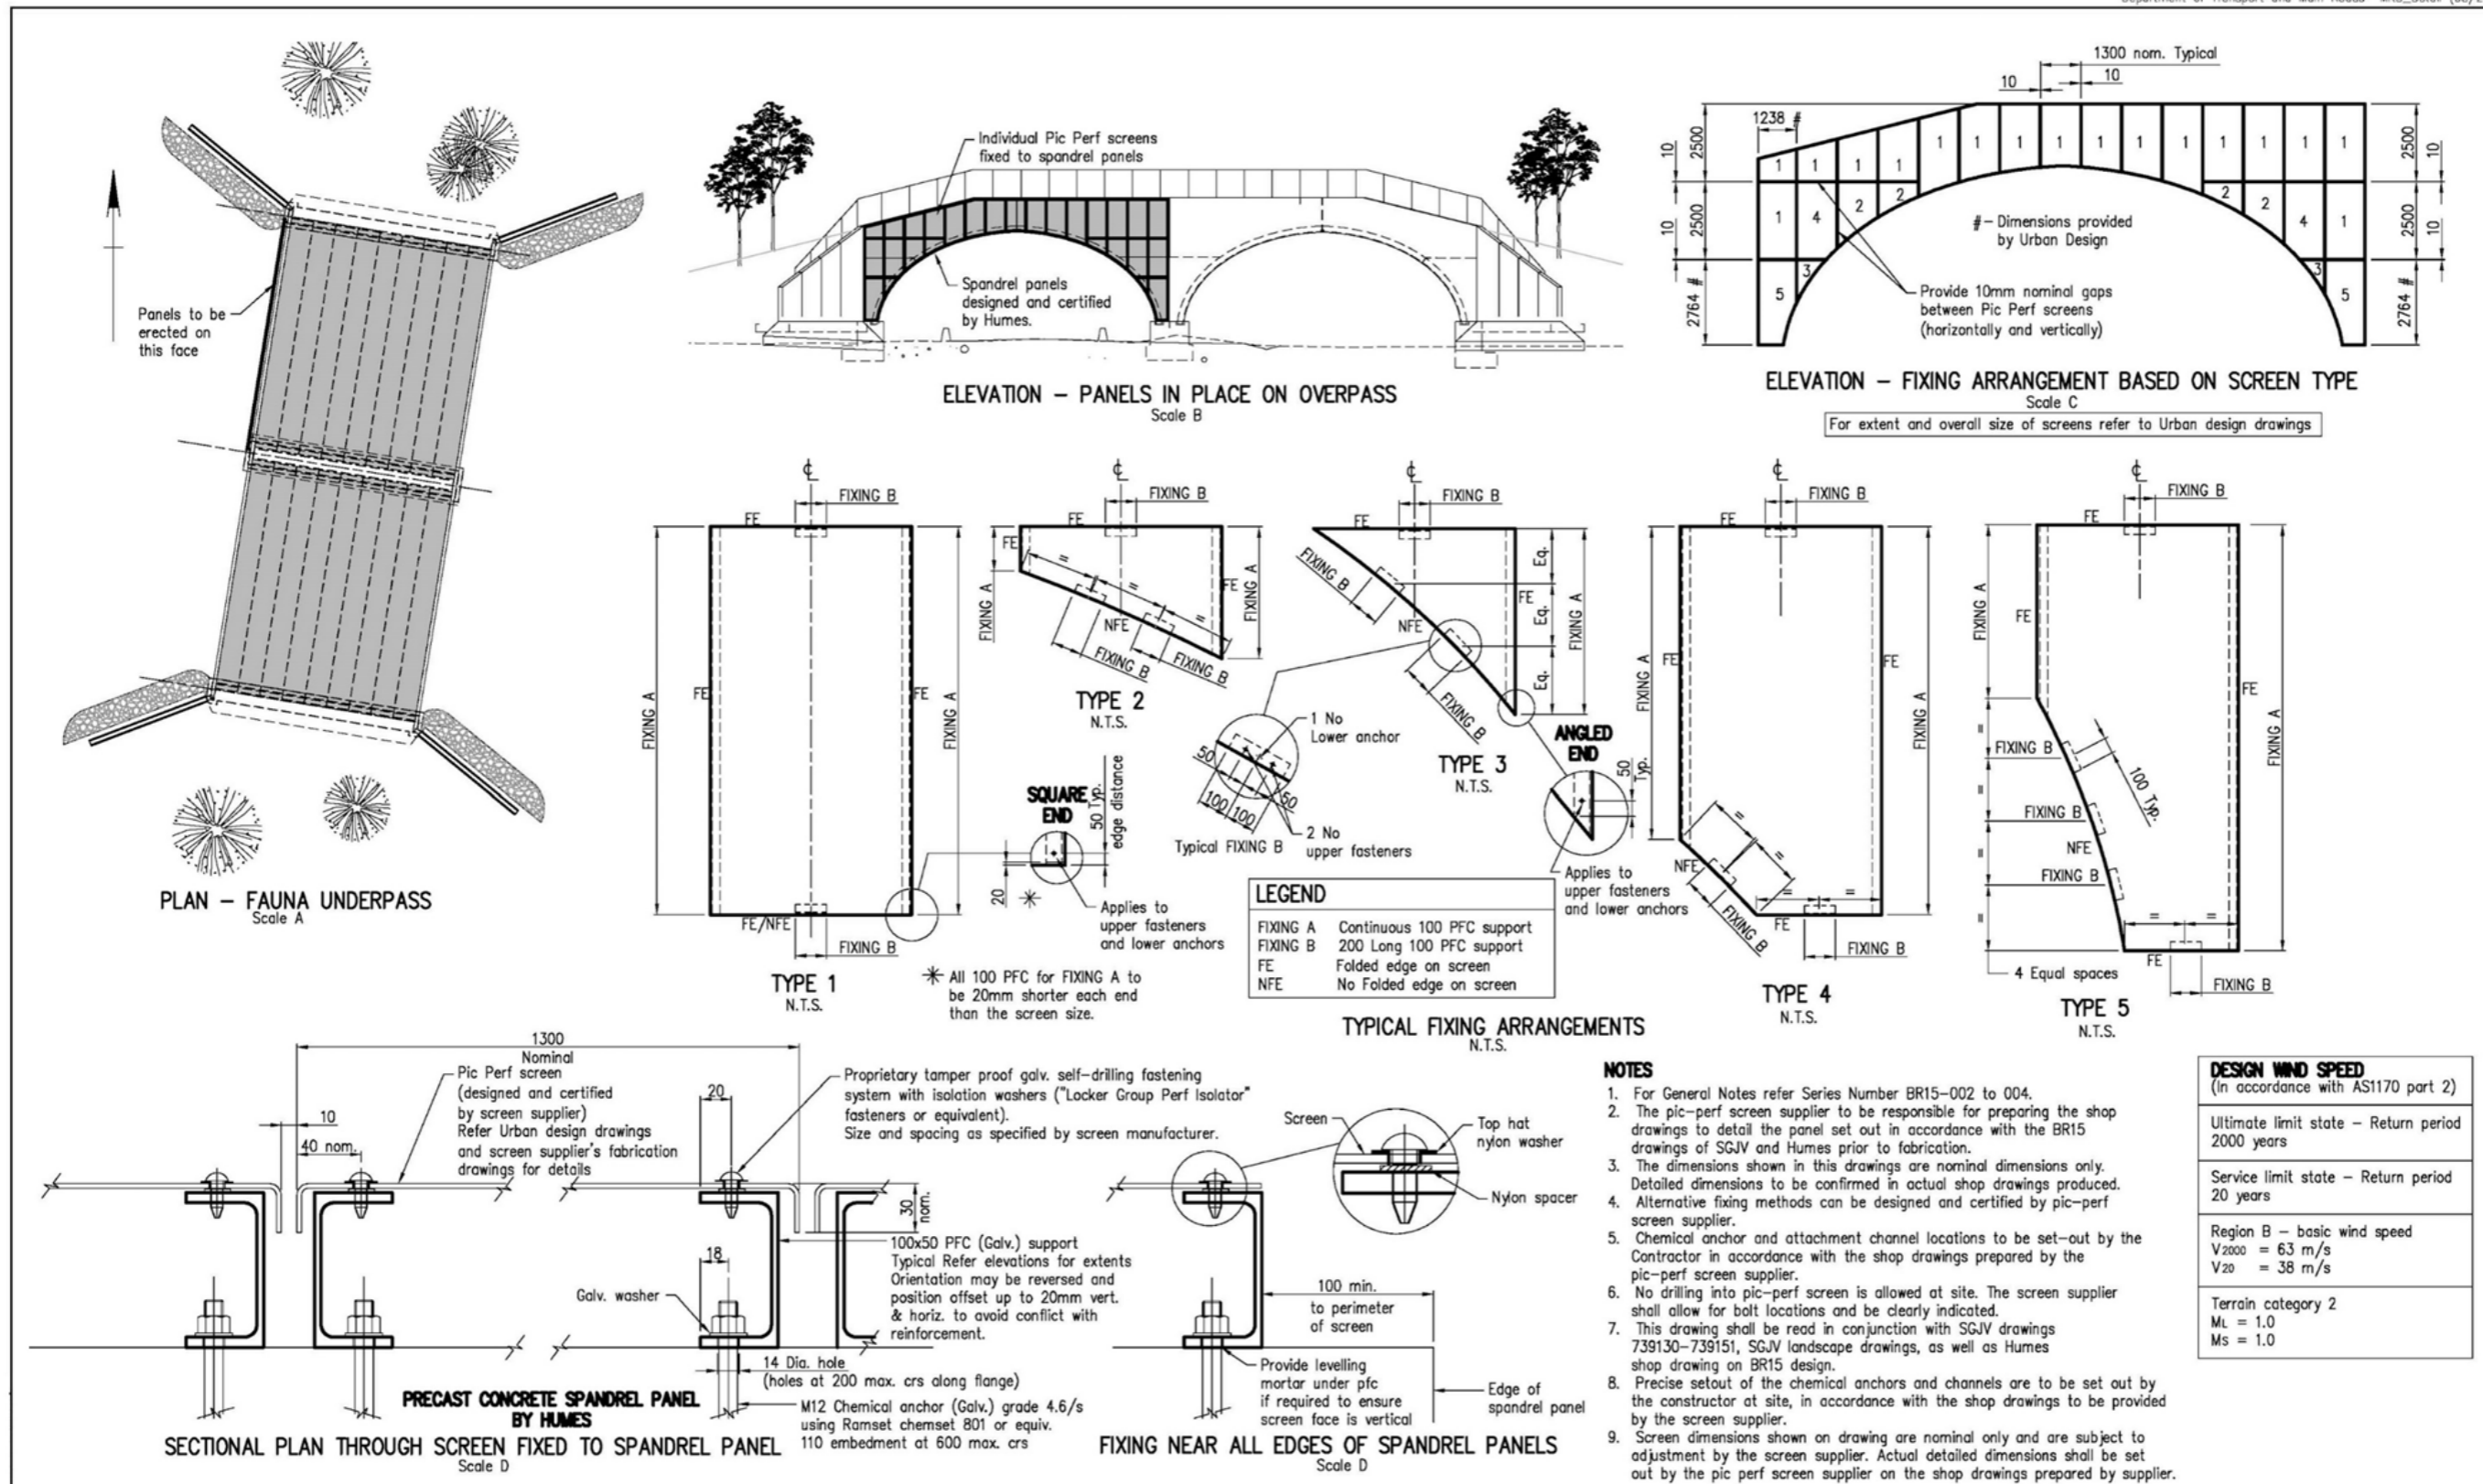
(f) - Concrete arch fauna crossing - Sheet 2
